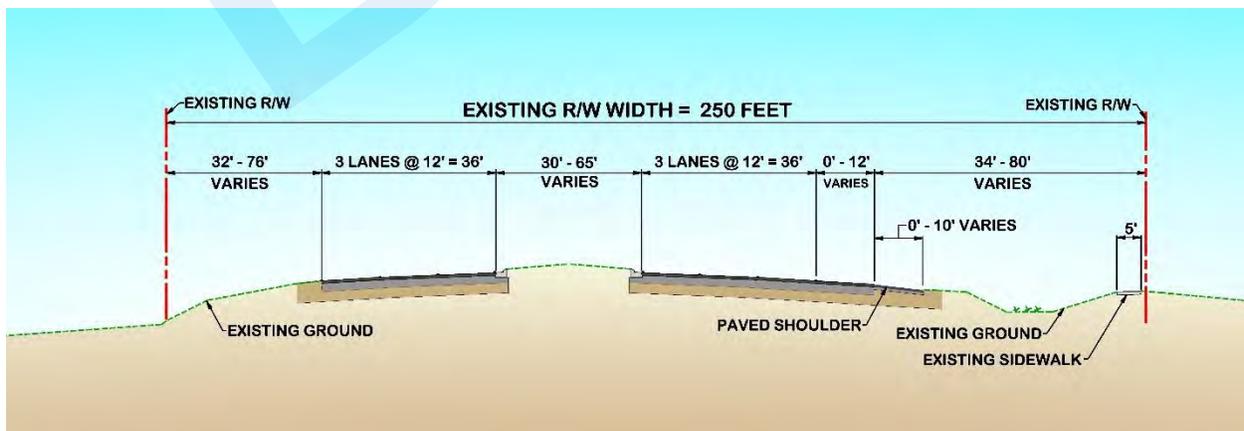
Existing SW 10th Street Typical Section - Powerline Road to Quiet Water Business Park Entrance Road
